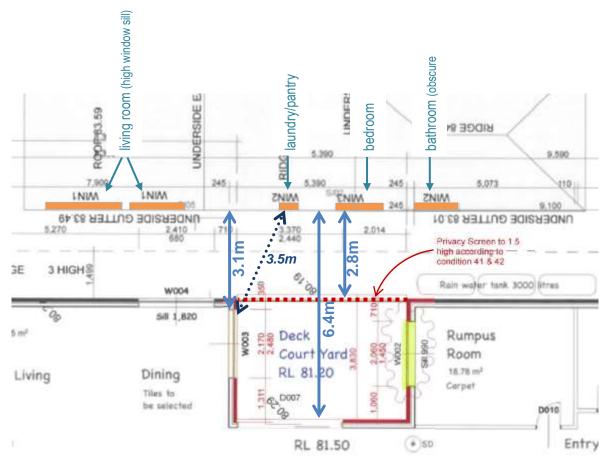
Ground floor deck courtyard and ground floor windows of No. 5 Brabyn
